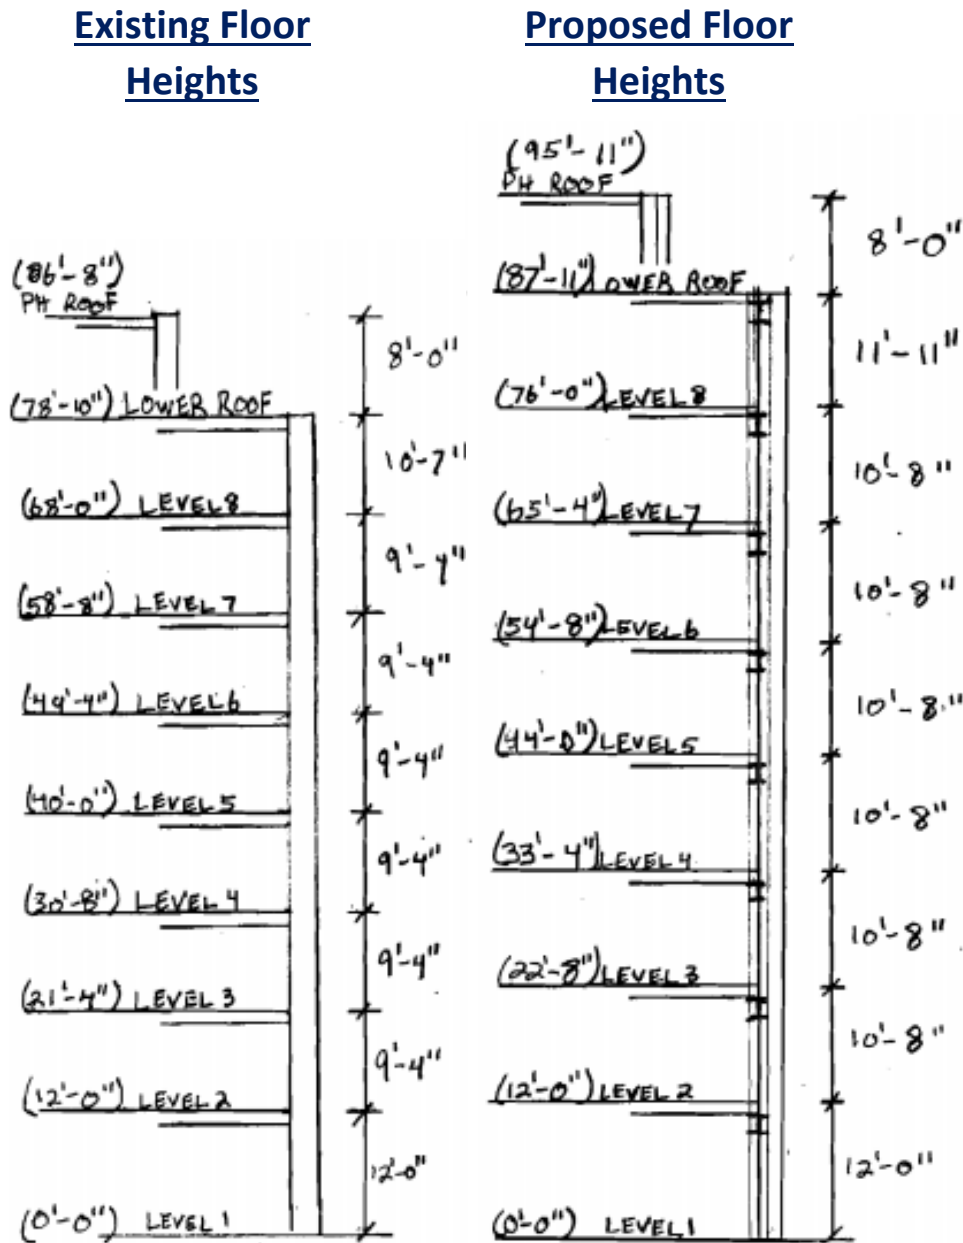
Floor height differences between existing and proposed systems *This difference is the comparison of a concrete slab in the existing system VS. the required steel beam sizes for the proposed project.
